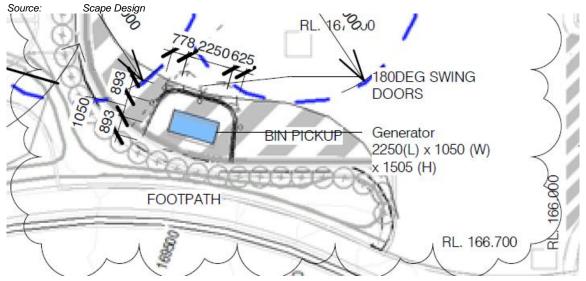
Proposed location of potable water generator with bollard protection Source: PTW
